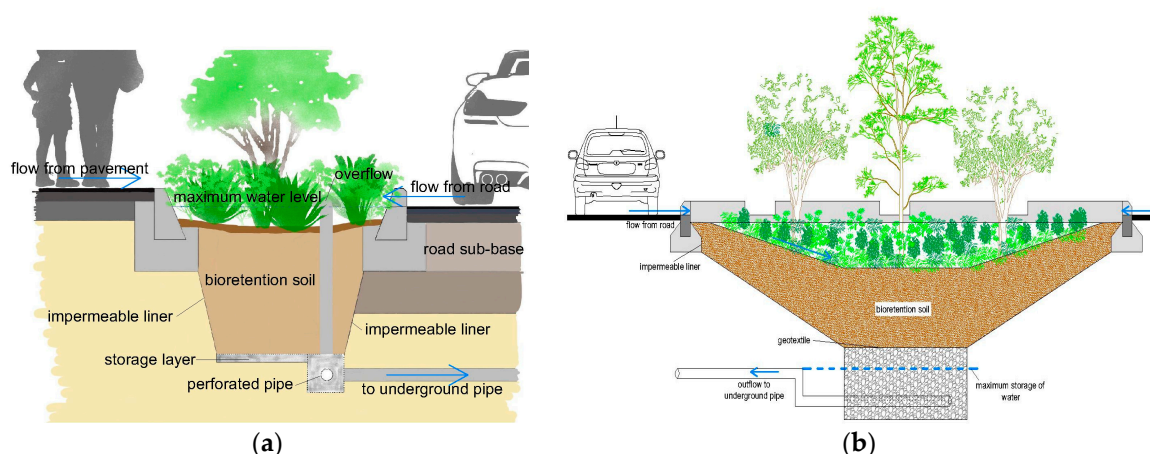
(a) Sketch of a street scape bioretention system. It is usually placed in main roads with no parking allowance. In case of the presence of a parking lane, a pavement of about 0.60 m should be installed between the system and the road; (b) conceptual sketch of a bioretention system in a roundabout.
